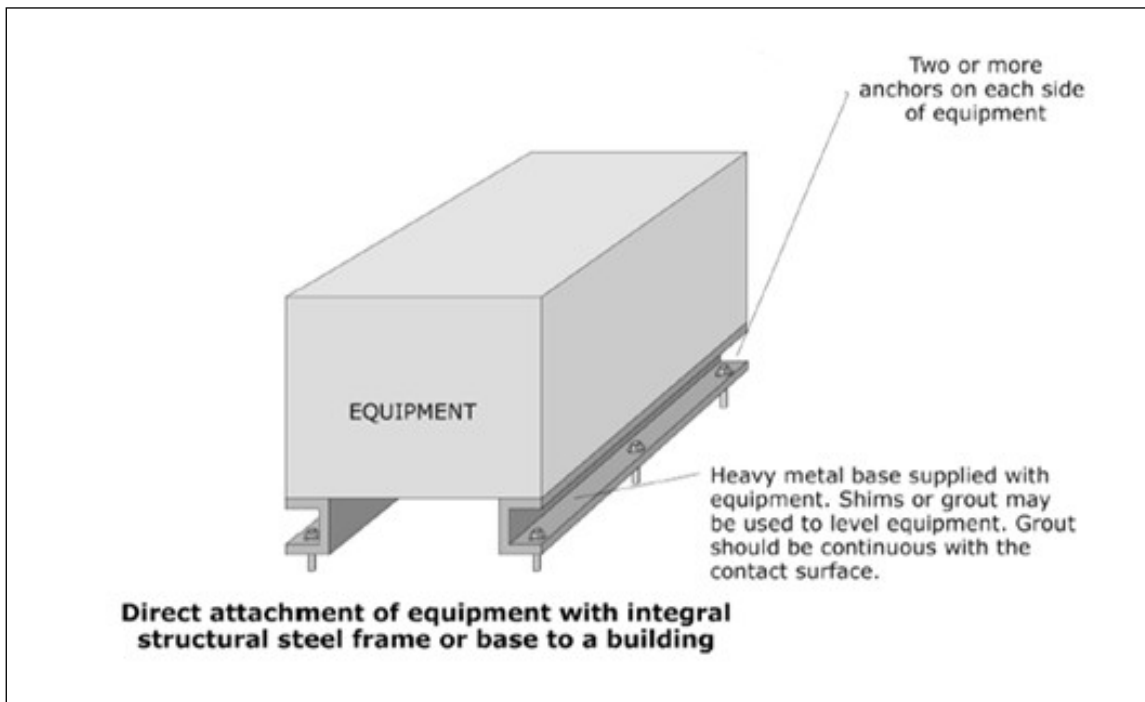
B. Example of equipment welded/bolted to steel structural beams which are anchored to structural floor (Figure 6.4.1.1-6 from FEMA E-74)
